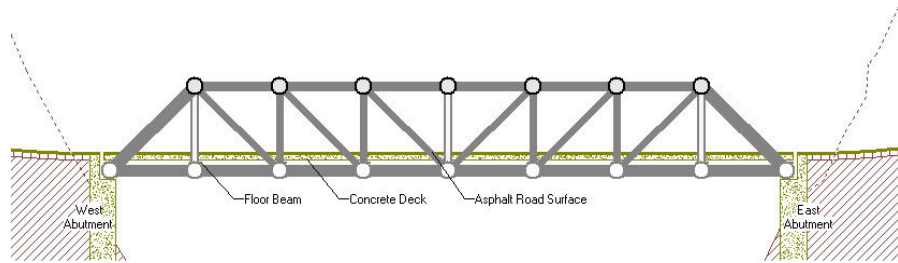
Example of Bridge Designed with West Point Bridge Designer
